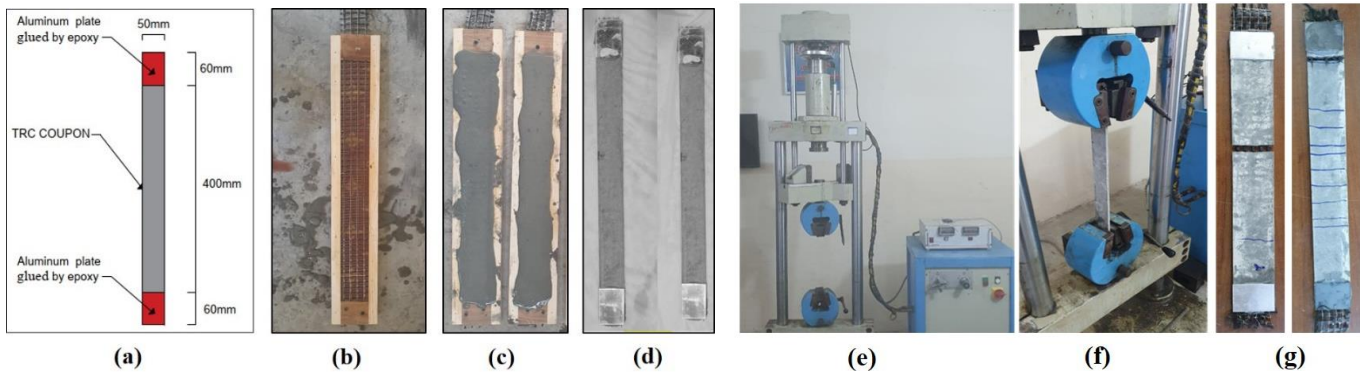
Details of TRC coupons test, (a) geometric of coupon, (b) details of the mold, (c) casting stage, (d) TRC coupons glued with Aluminum plates after heating, (e) universal testing machine used, (f) test set up, (g) failure mode.
